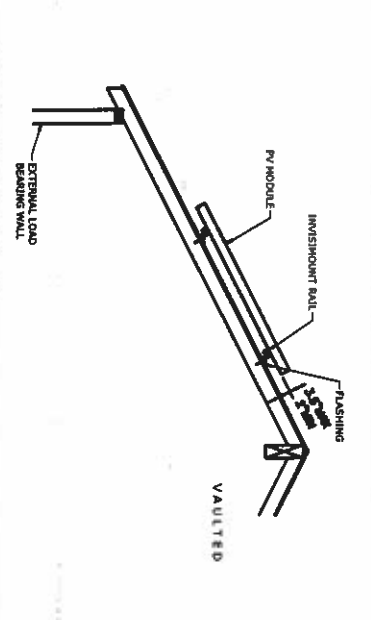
ROOF 2 STRUCTURAL FRAMING DETAIL
